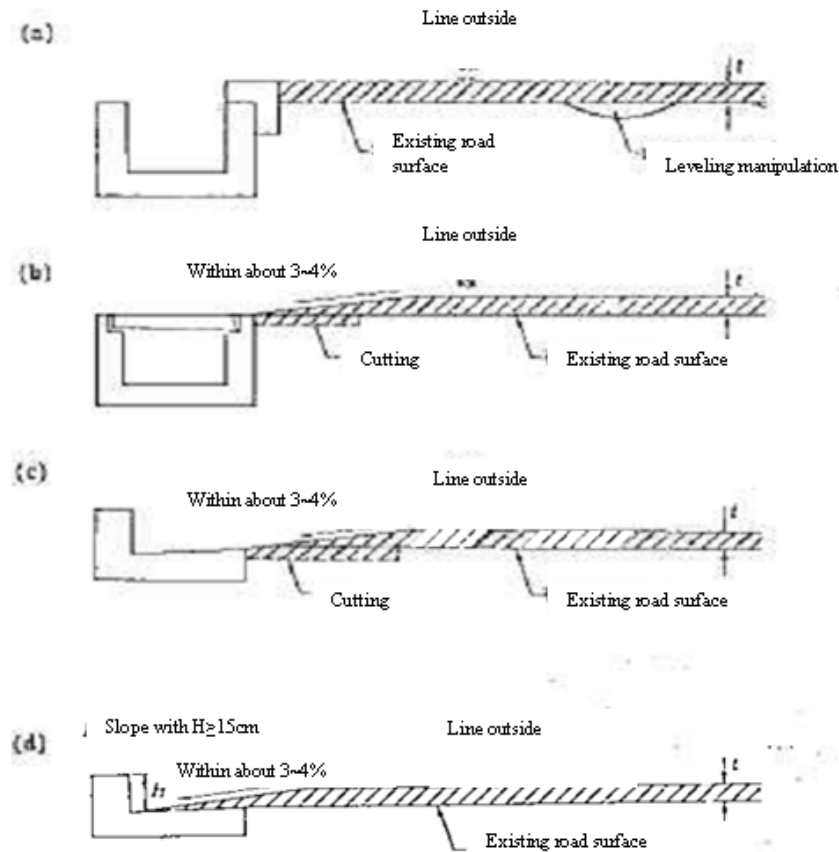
(a) – Slope adjustment between old and new pavement surface after overlaying in case of having pedestrian track
